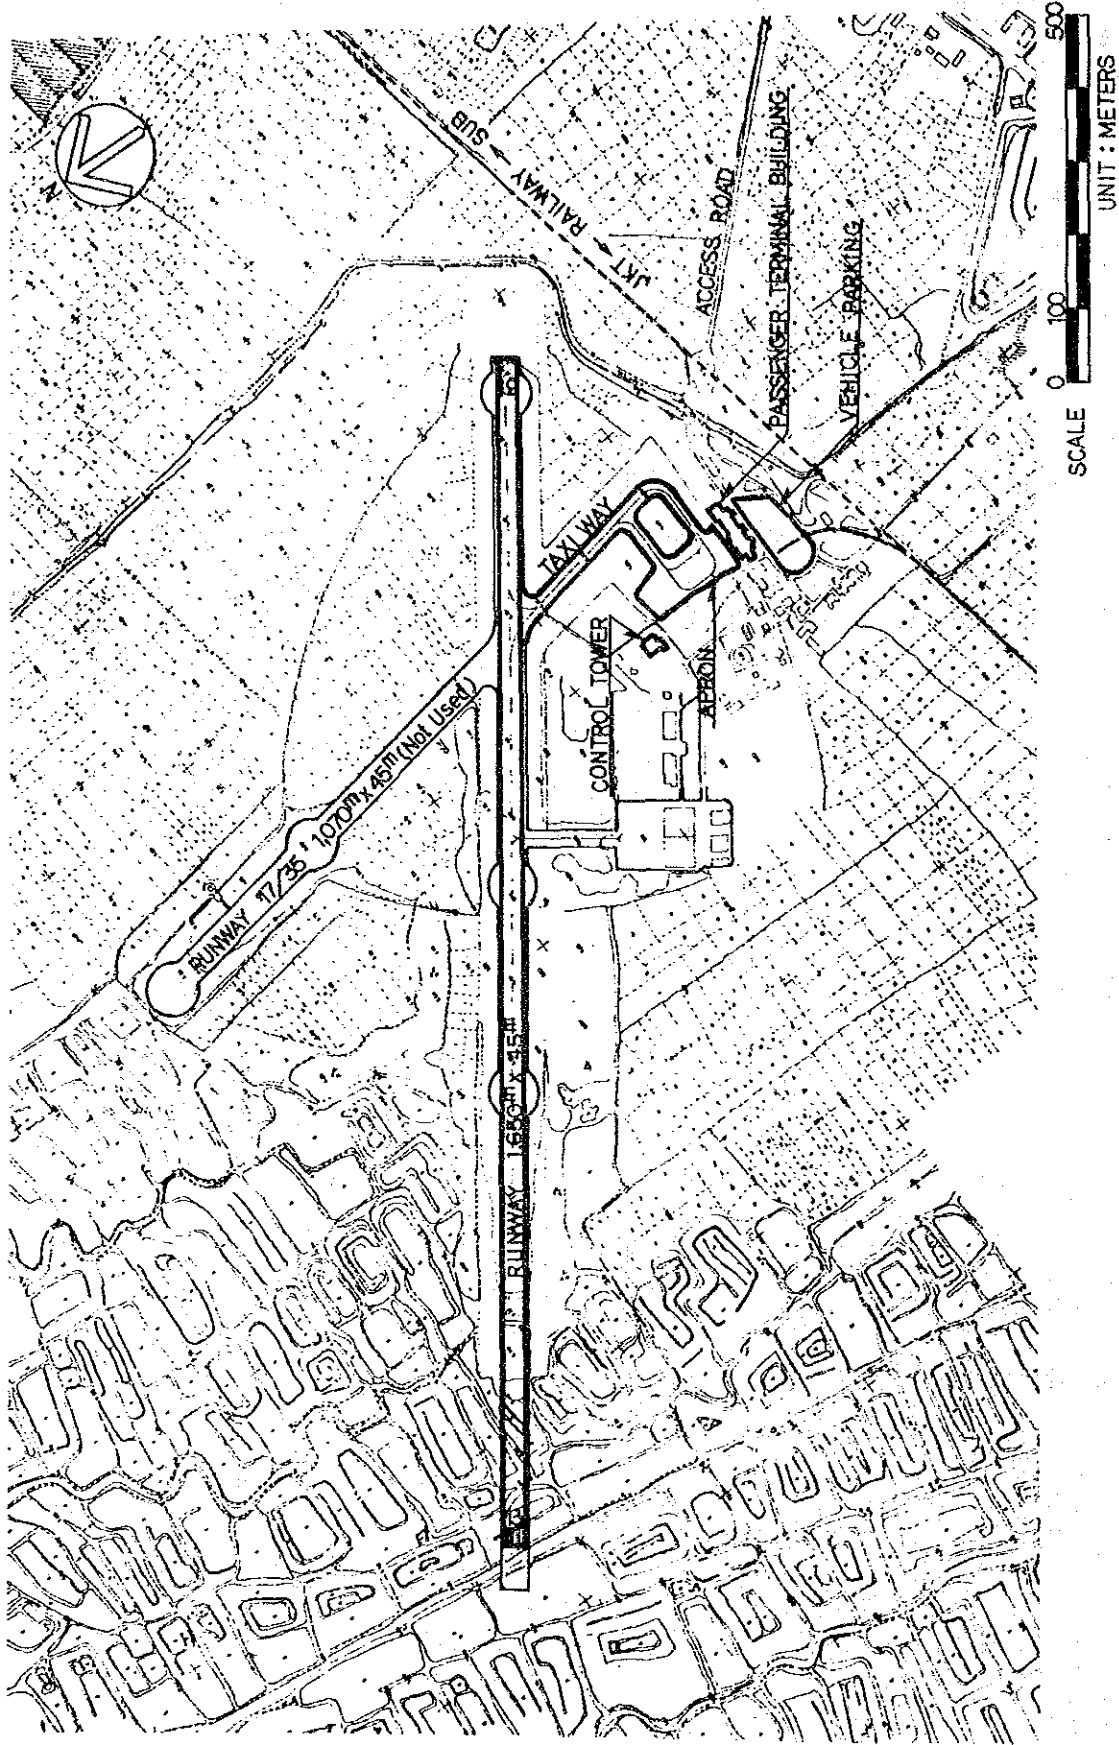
Layout Plan of the Existing Semarang Airport
